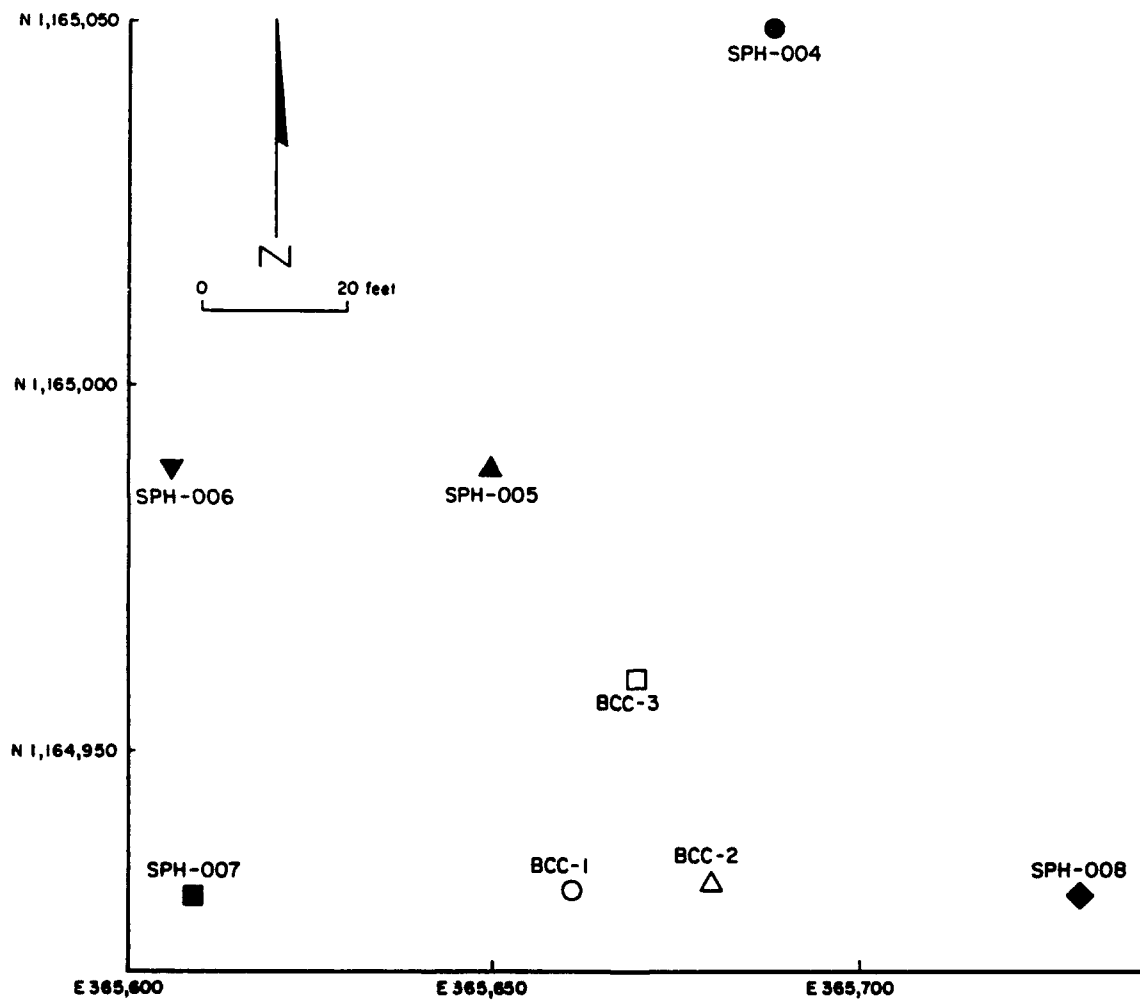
Plan View of Sector H Test Site at Jackson Lake Dam
